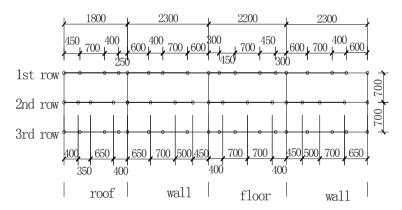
Diagrammatic cross-section of grouting holes for water blocking of inclined shaft.
